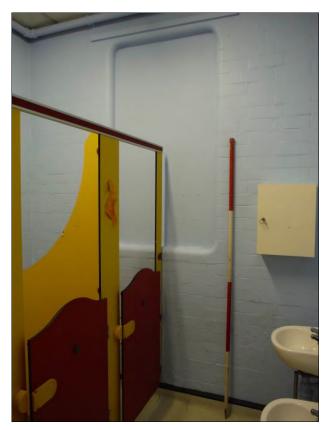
North wall of Room G18 showing blocked original window (Scale = 2m).
